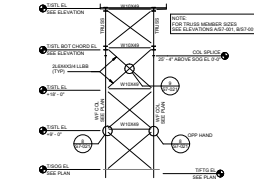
DETAIL - DOOR RAIL GUIDE SUPPORT - FOUNDATION
